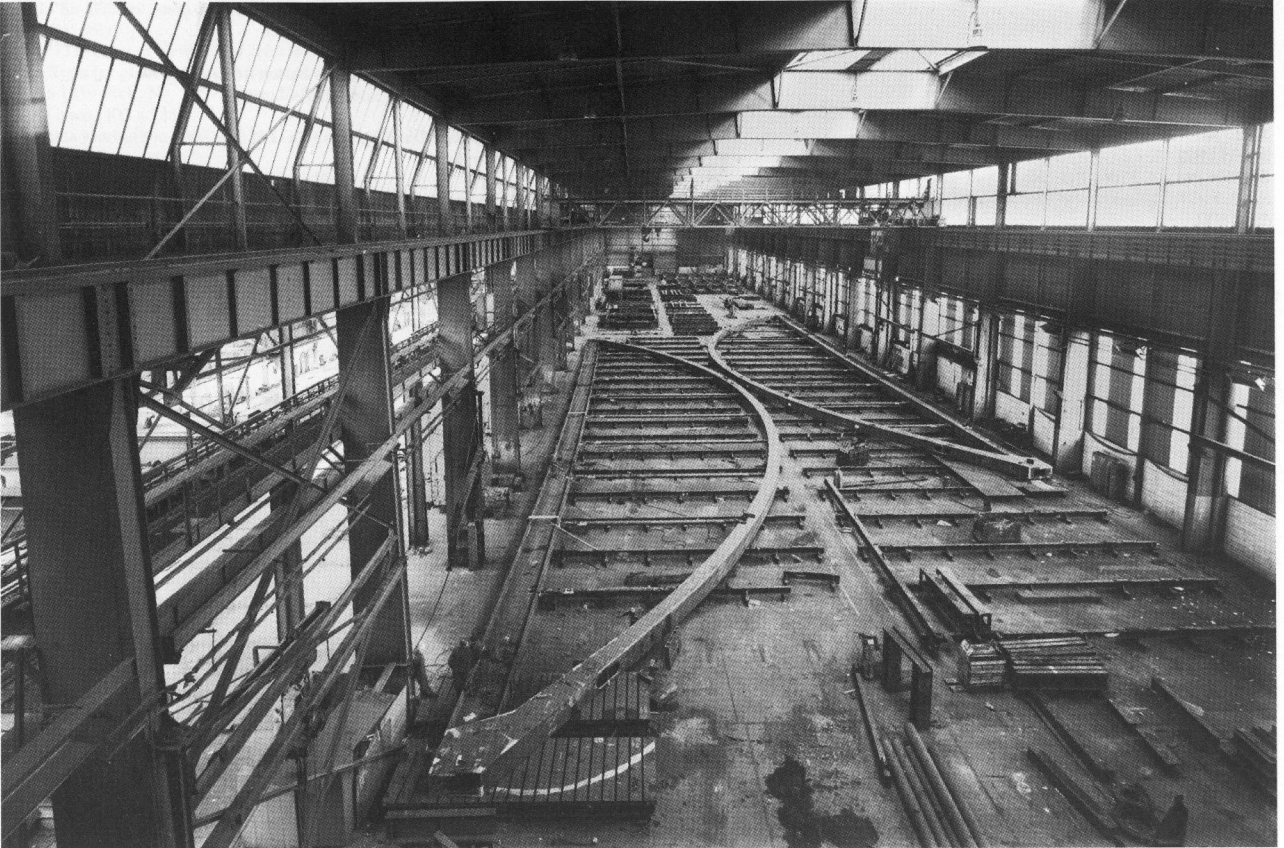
Elevated view from south within the erecting shop of Arrol's Dalmarnock Iron Works in Glasgow, showing the company's last construction contract, new Bonhill Bridge, being assembled (A 38382, 1986, RCAHMS, item 67).
